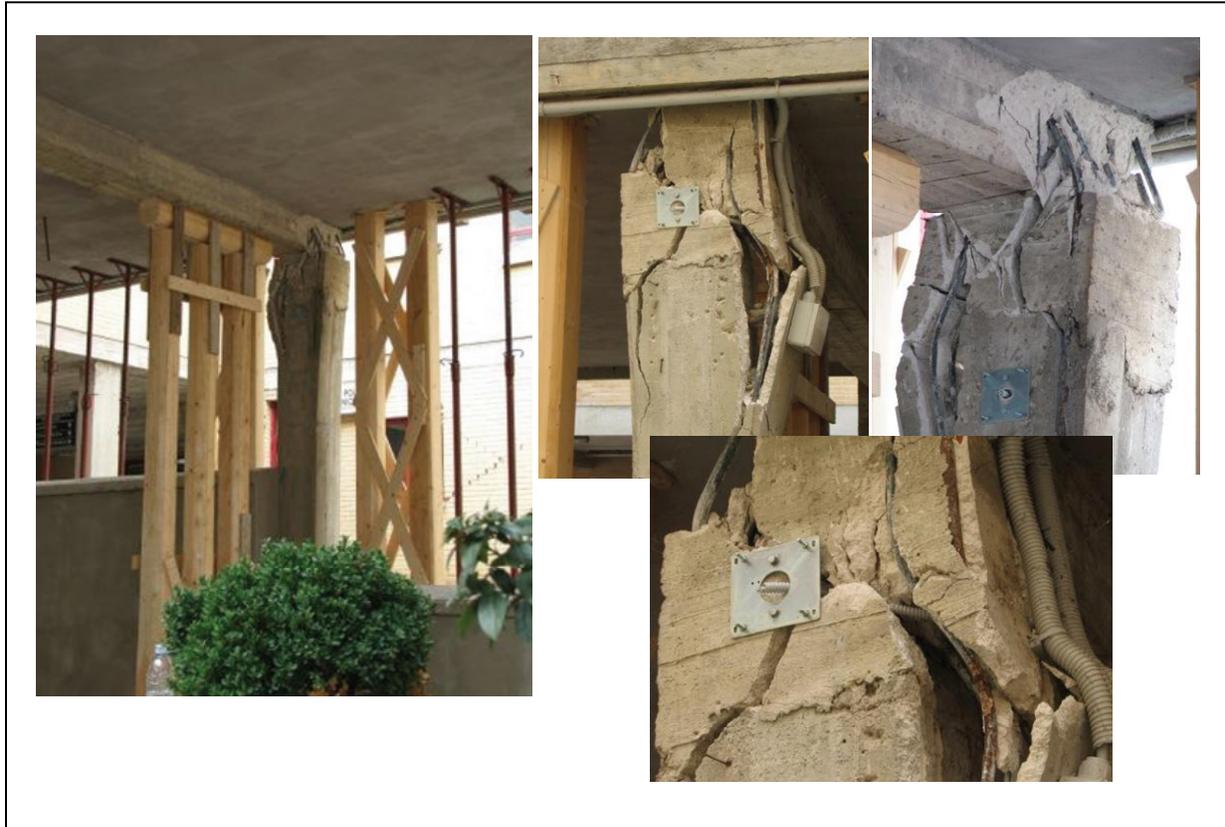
Poor construction quality: electric tubes passing through reinforced concrete column of the emergency walkway
